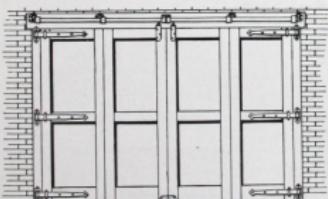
Elevation showing hardware outside the doorway when "Slidelite" No. 435 four-door equipment is applied to doors opening out.
